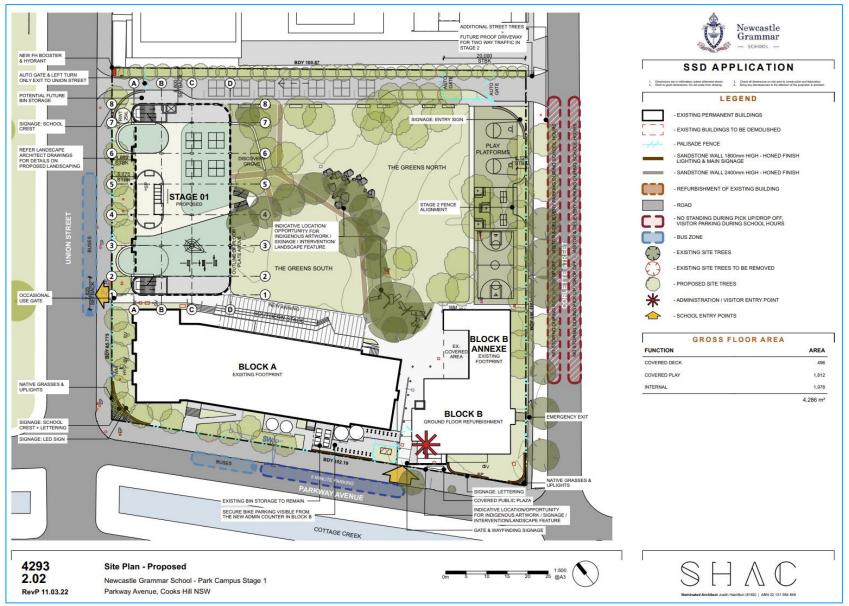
SSD-13895306 Project Stage 1 Site Plan
